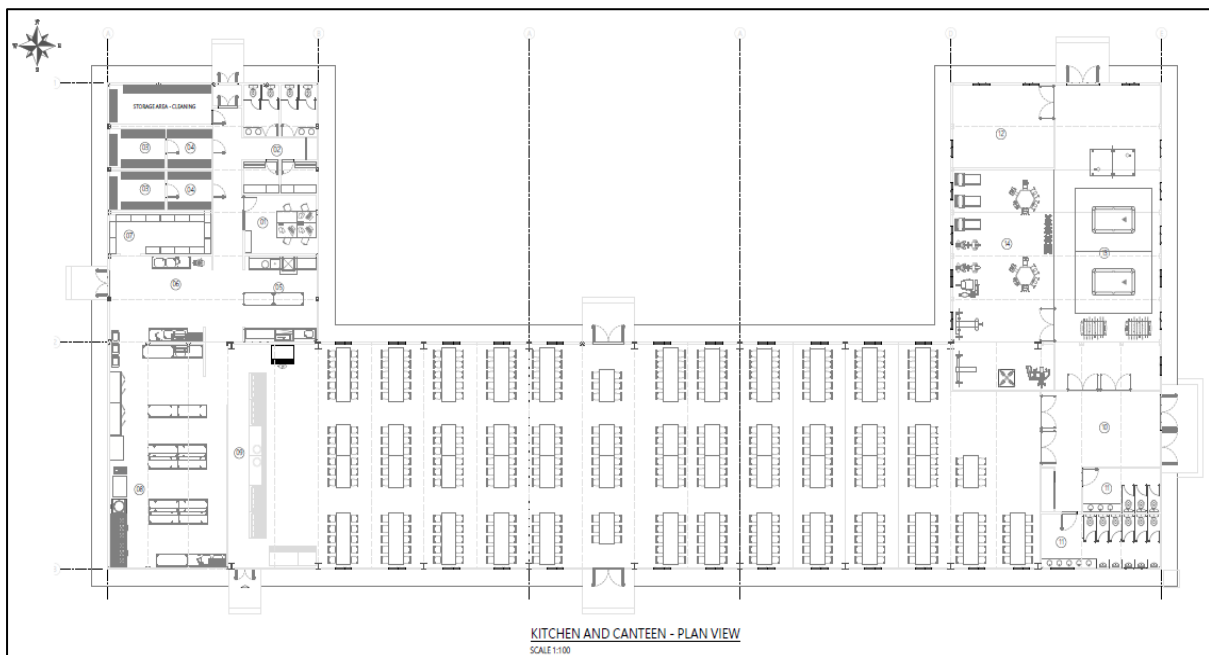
Typical Lay-out of kitchen, canteen & recreational facility
